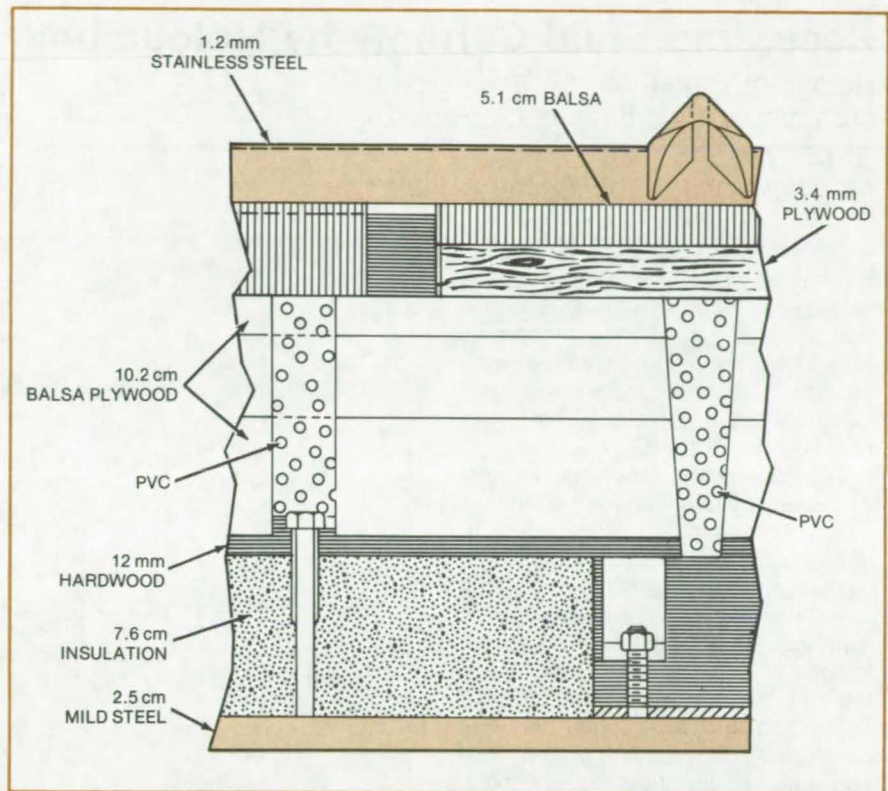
LNG Tank Wall consists of several layers that include steel and wood construction and insulation.
